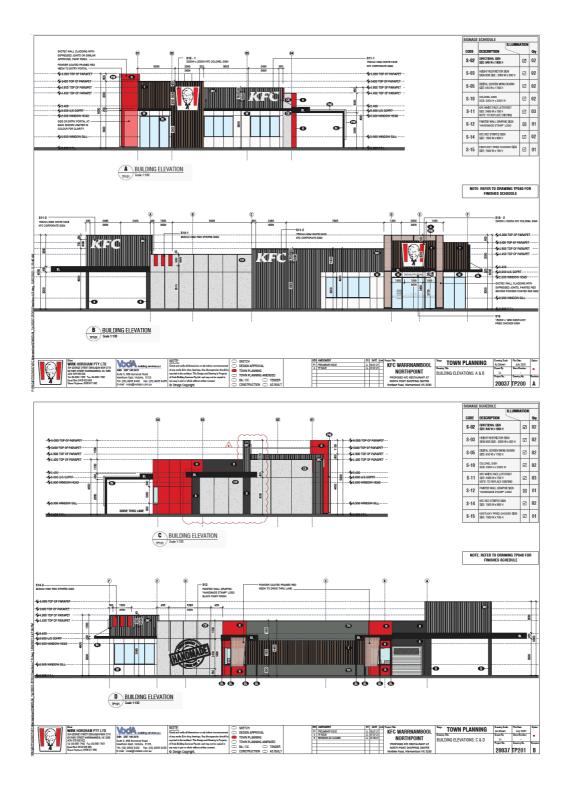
Proposed elevations (Source: Plans submitted by the applicant)
